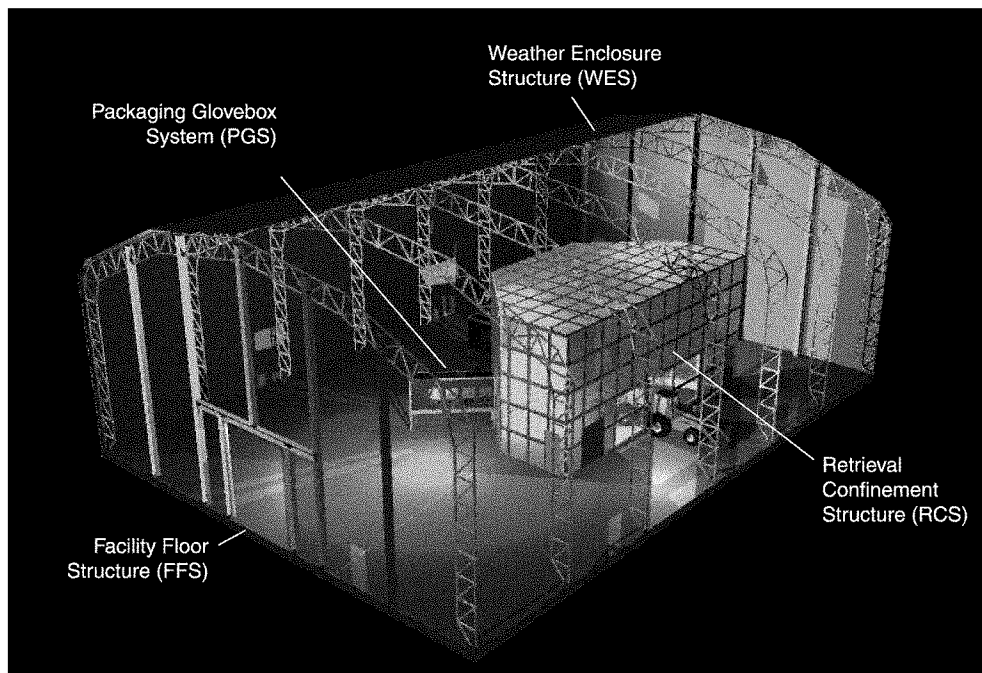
Facility layout of the OU 7-10 Glovebox Excavator Method Project.
